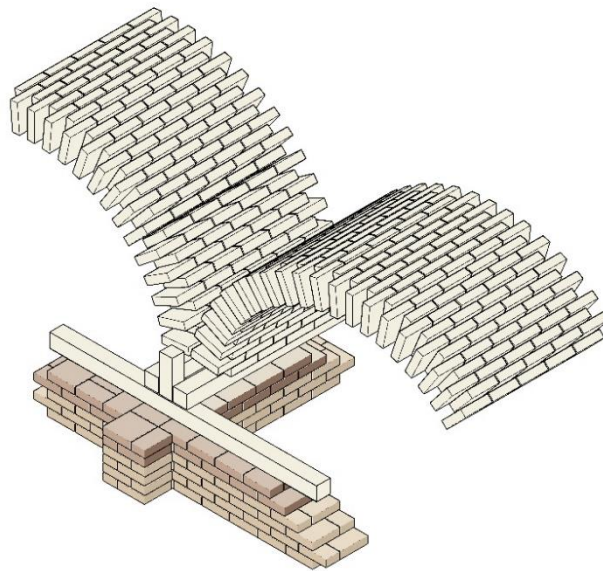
, mud brick walls with the last row(s) of burnt bricks beneath the light tensile beams of steel or wood, and vaulted roofs, drawing by author
